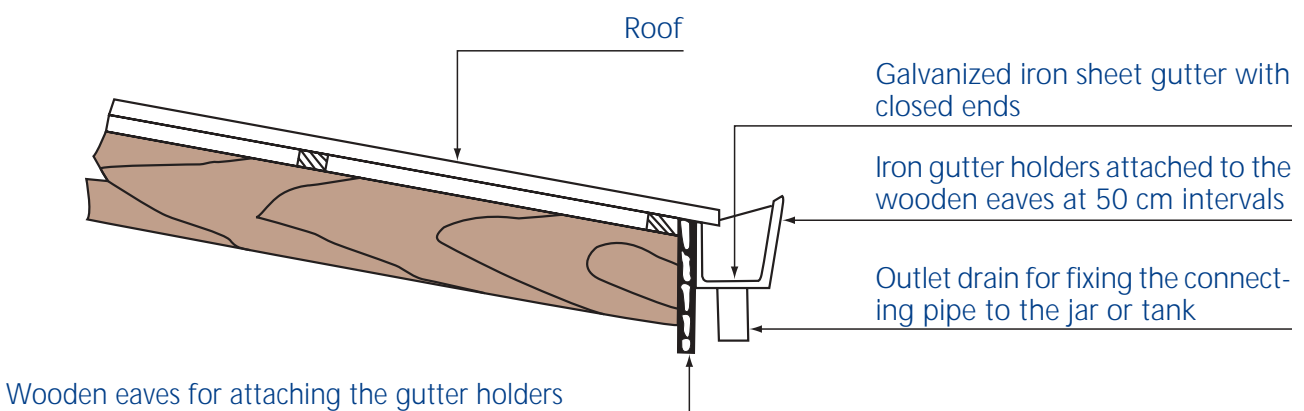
Fix the "U" shape galvanized iron sheet gutter to wooden roof structure using the iron gutter holders.
